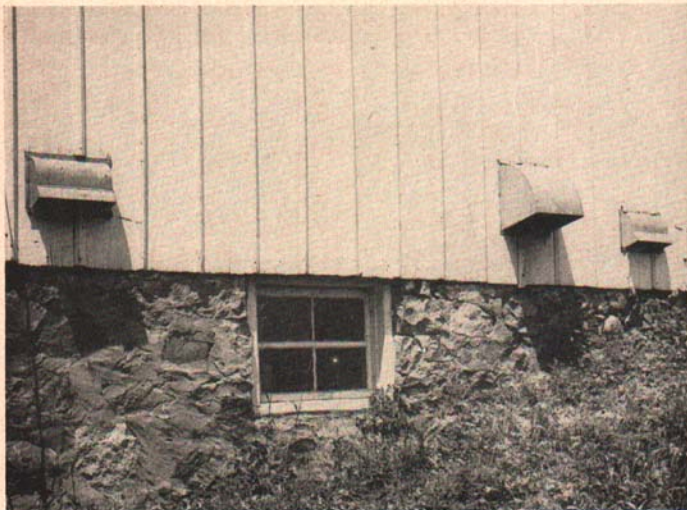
Outside view of parts of a mechanical ventilating system. The smaller metal guards, at the extreme left and right, are for the automatic fresh air inlets. The larger hood protects the exhaust fan (see diagram in Fig. 4).
